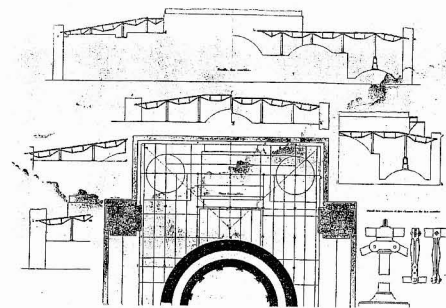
St. Isaac's Cathedral: plan and section of the beam structures above the brick vaults (from A.R. Montferrand, *Eglise Cathédral de Saint-Isaac*).
